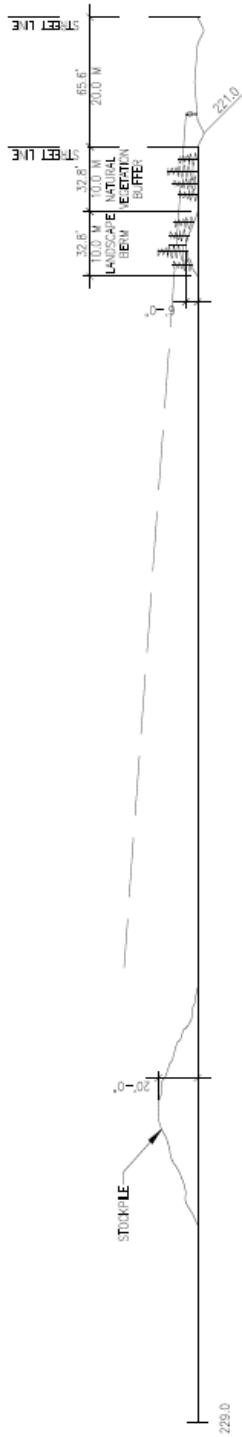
Cross Section through the C&D Processing Facility (dwg RZ-3)
